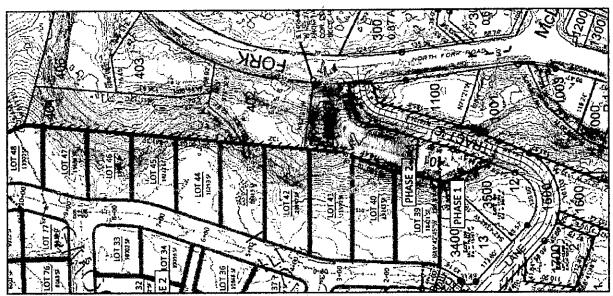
North to left view, Sloped topography of proposed Riverview Meadows Phase 2 Subdivision. Site plan and LIDAR-based topography Provided by Morgan Civil Engineering, Inc.
